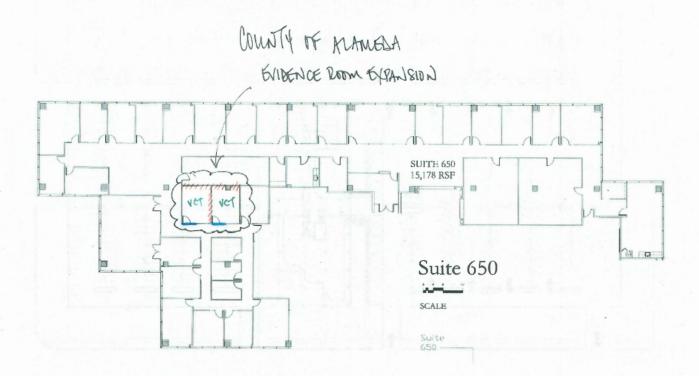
<u>SITE PLAN OF THE PROJECT</u>
